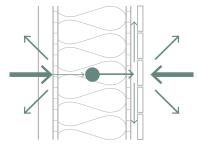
Damp-open construction (Het bewuste stel, 2020)
